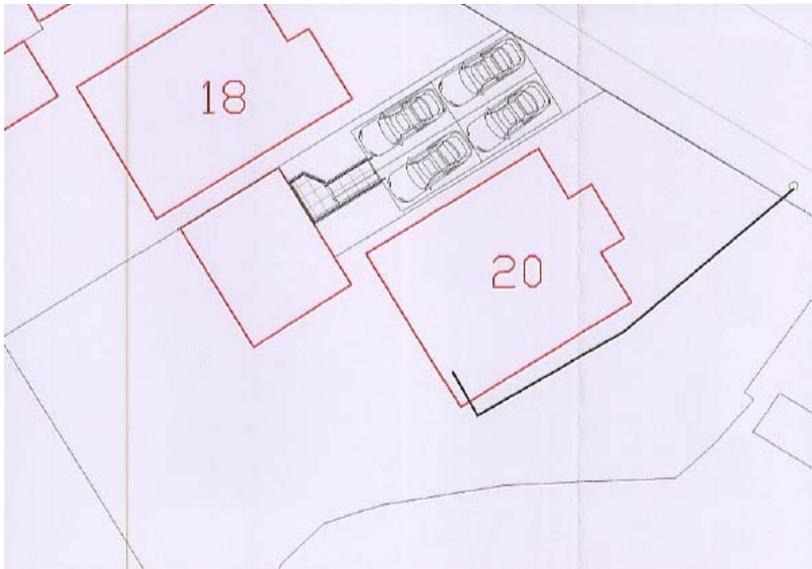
Proposed Site layout (Access Ramp and 4 no. Parking Spaces)
